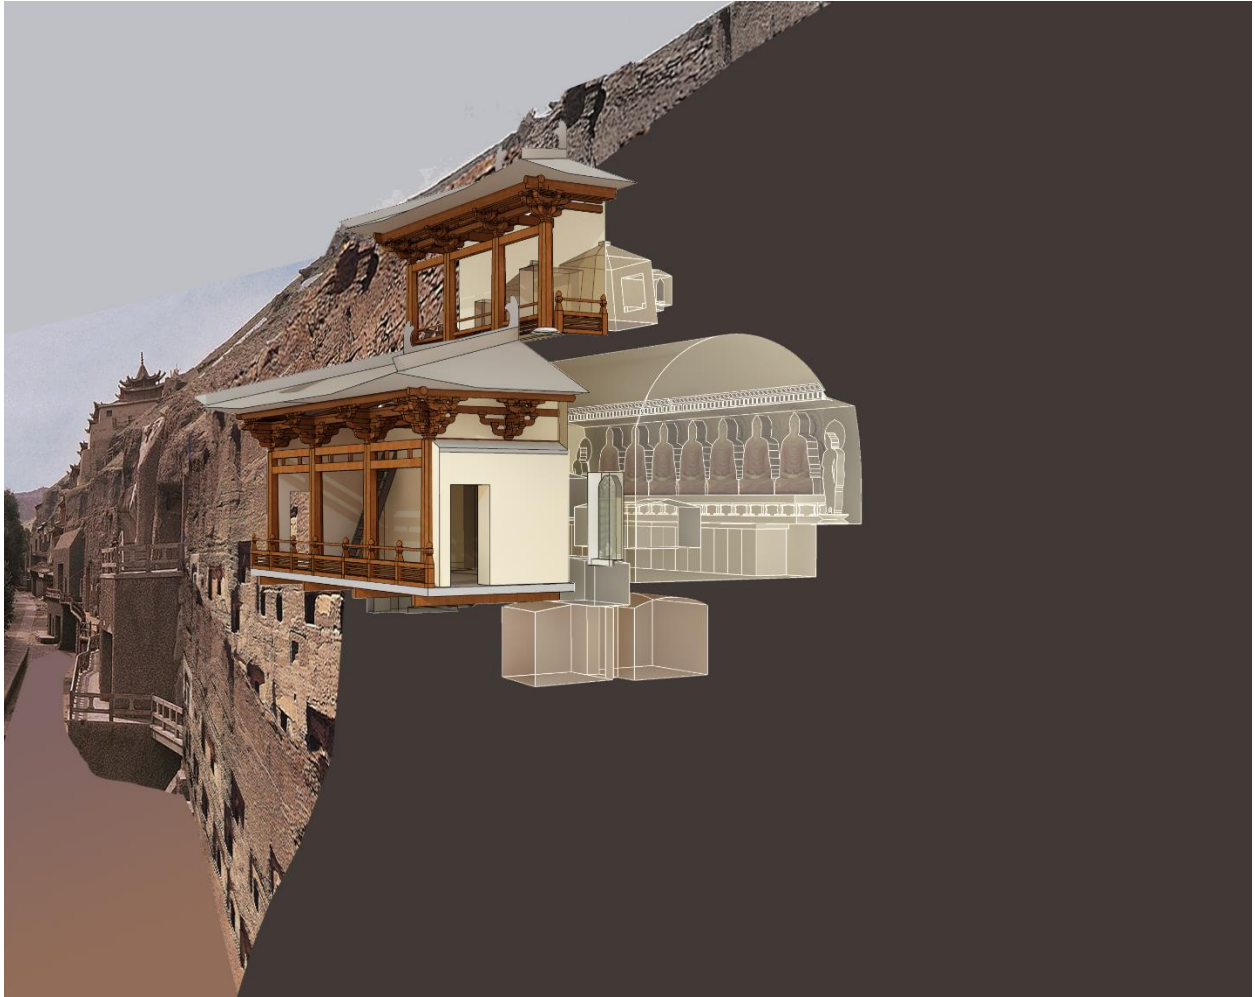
The author's reconstruction of Phase 2 in the construction history of the pavilion. A small cave triad was planned to be built above Cave 365, but only the central cave (Cave 366') was completed and the south cave (Cave 366A) was excavated. Drawing by author.
